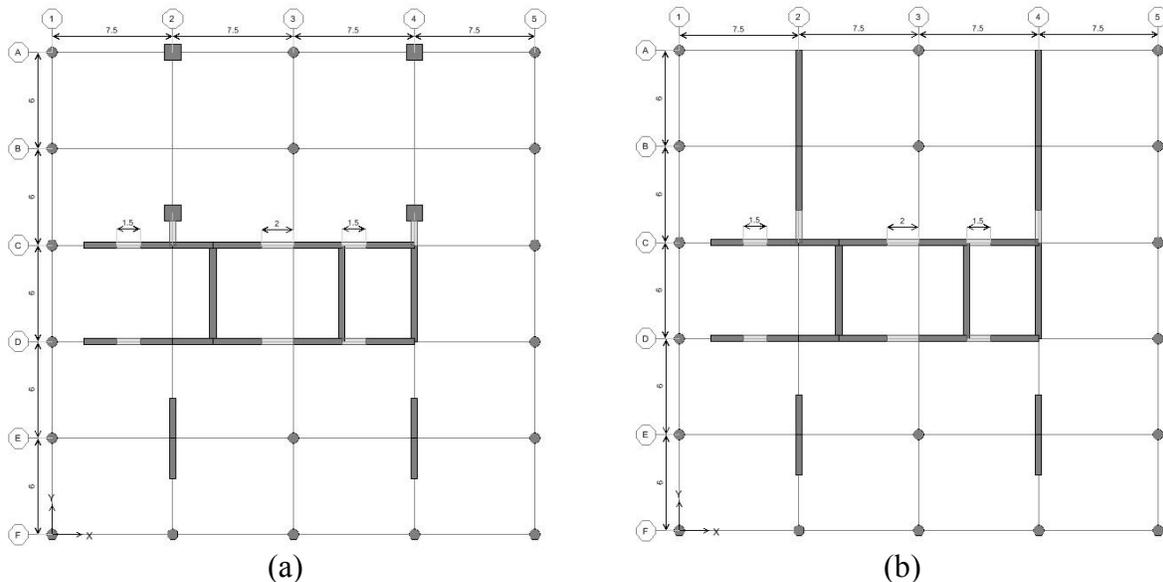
(a) Ground floor and (b) typical floor plan of the building
